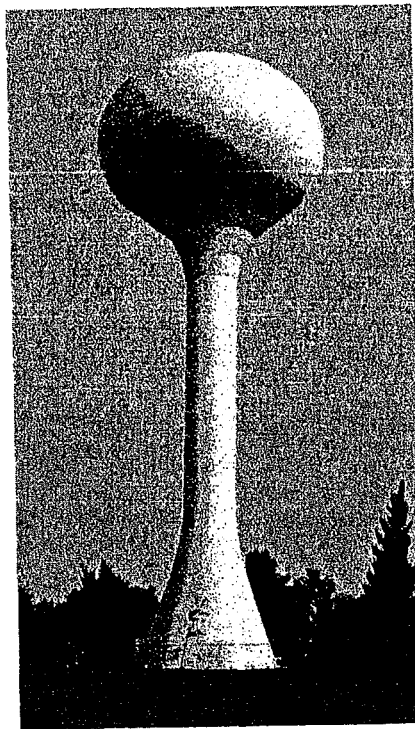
Elevated tank. (Photo courtesy of West Lafayette Water Company.)
